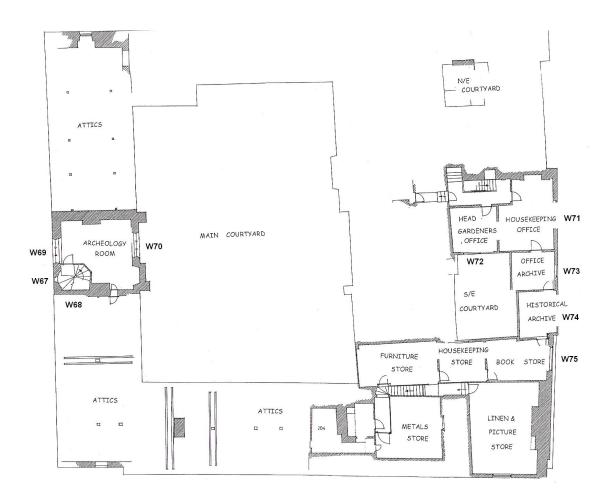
Plan of the second floor, Ightham Mote (© National Trust)
